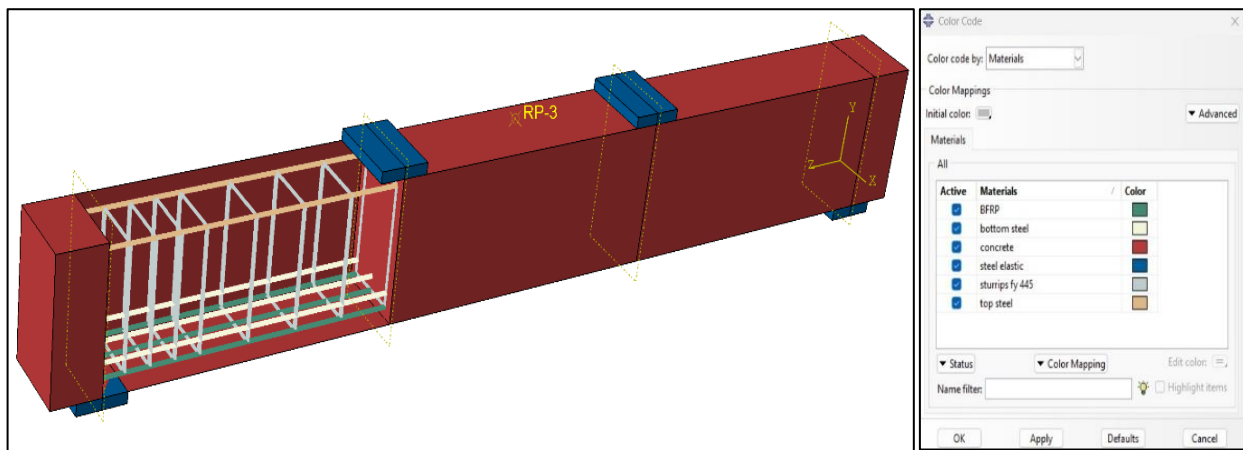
Three-dimensional finite element model of the hybrid reinforced concrete beam showing concrete body, reinforcement, loading and support plates
